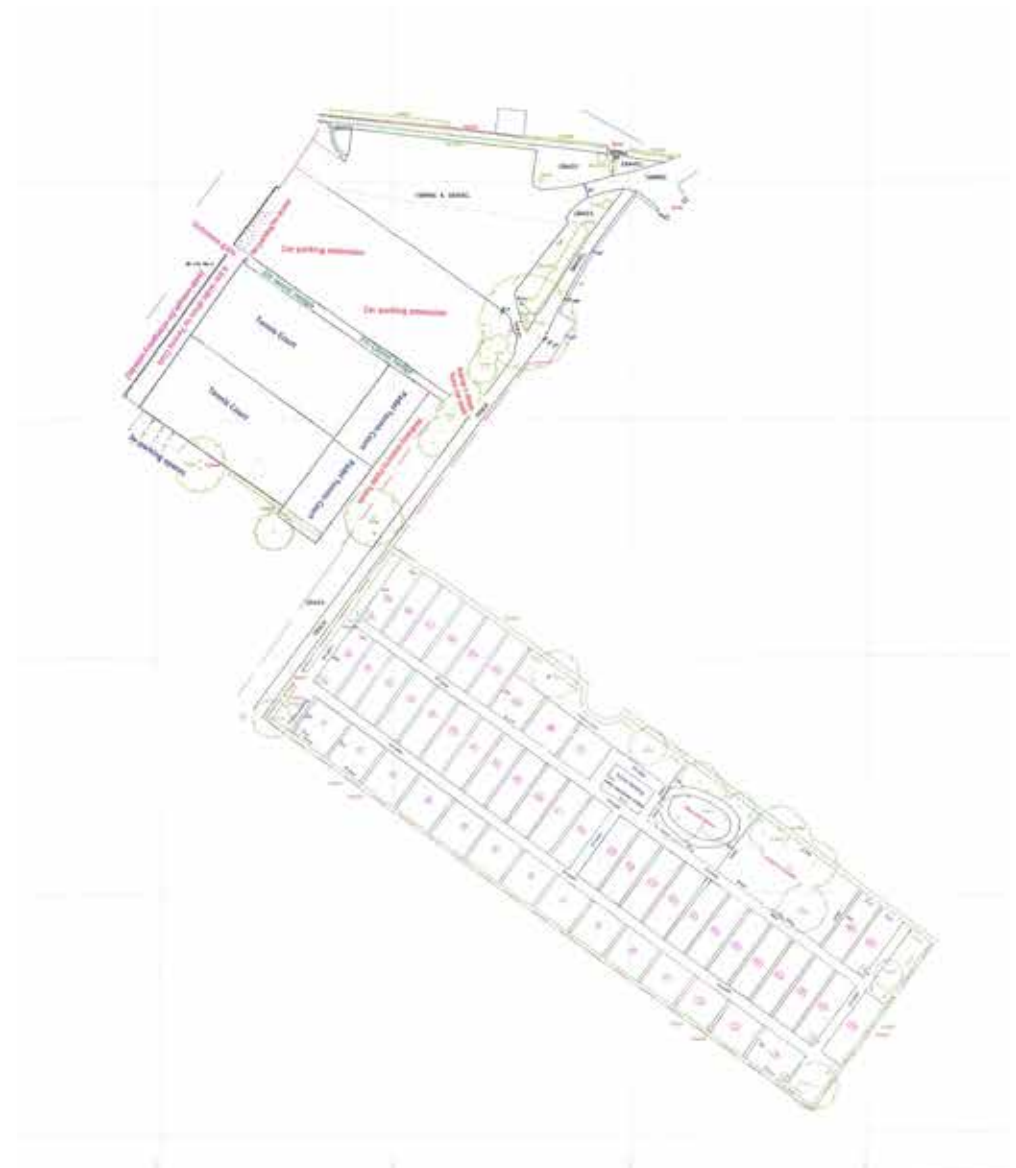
Schematic Site Plan (Source: Sitech Surveying Services)
